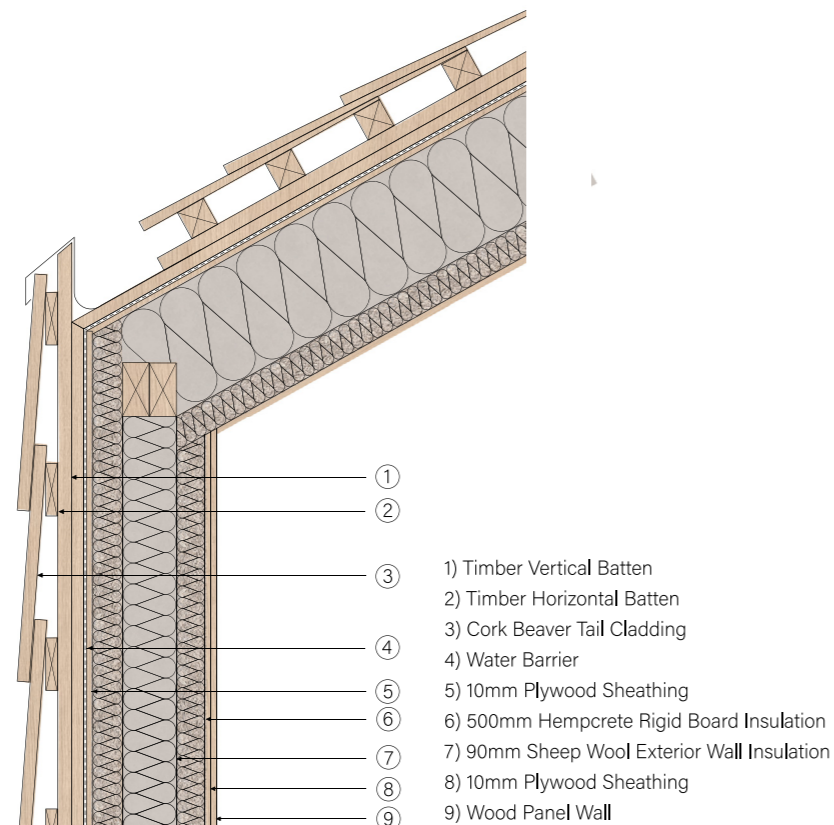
Cork Roof Detail Drawing (Scale 1:200)
